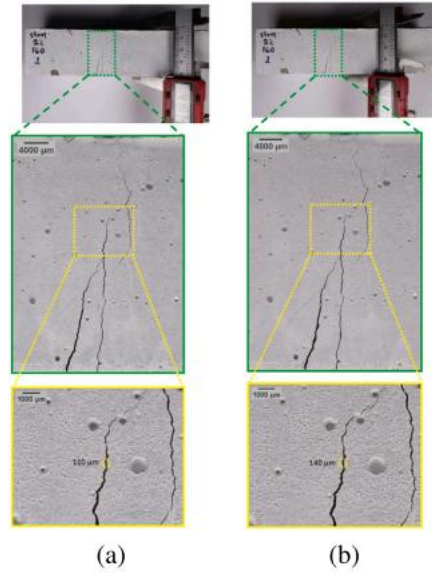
Crack opening in a specimen with steel fibers: (a) before heating, (b) after heating.
